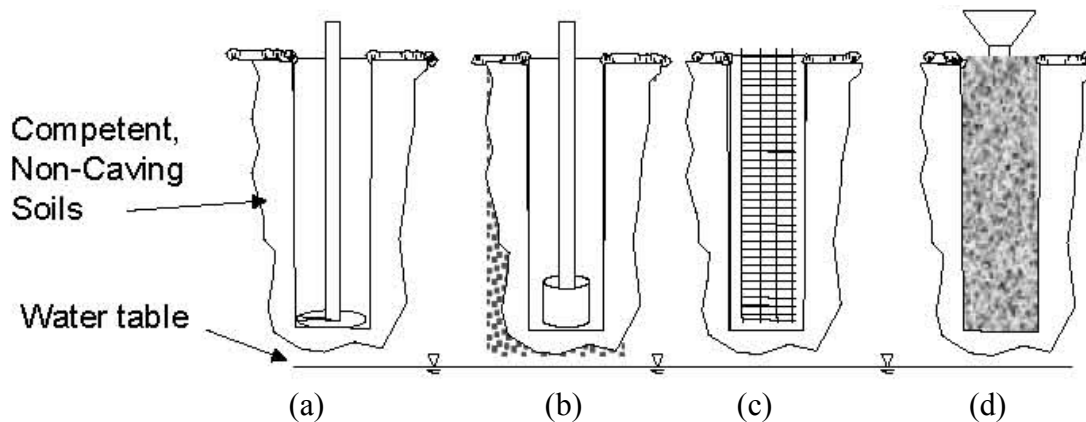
Steps in construction of drilled shafts by the dry method (a) drill, (b) clean, (c) position reinforcement cage, and (d) place concrete.
